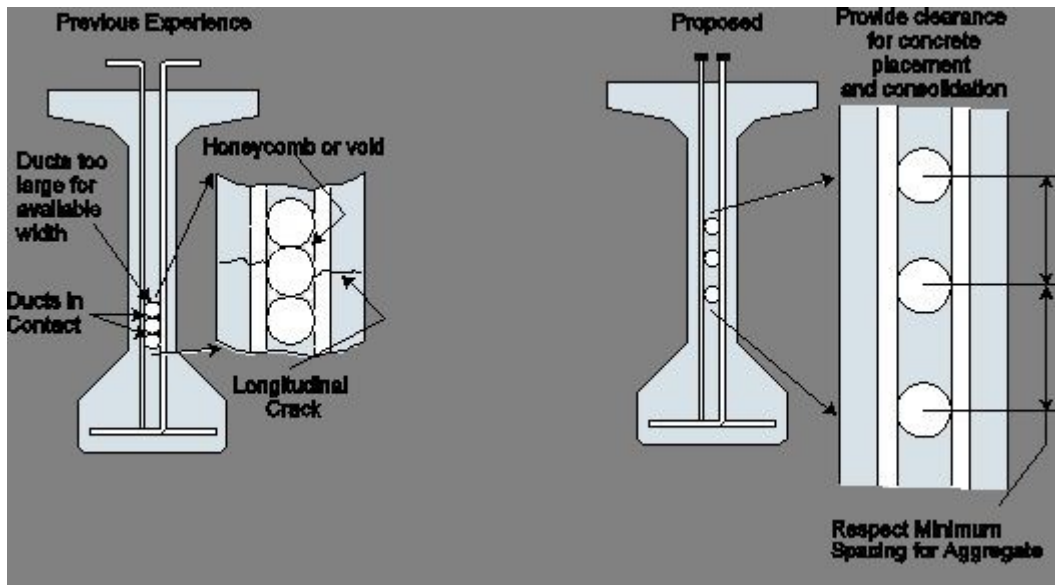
Duct spacing and clearance in post-tensioned precast girders
